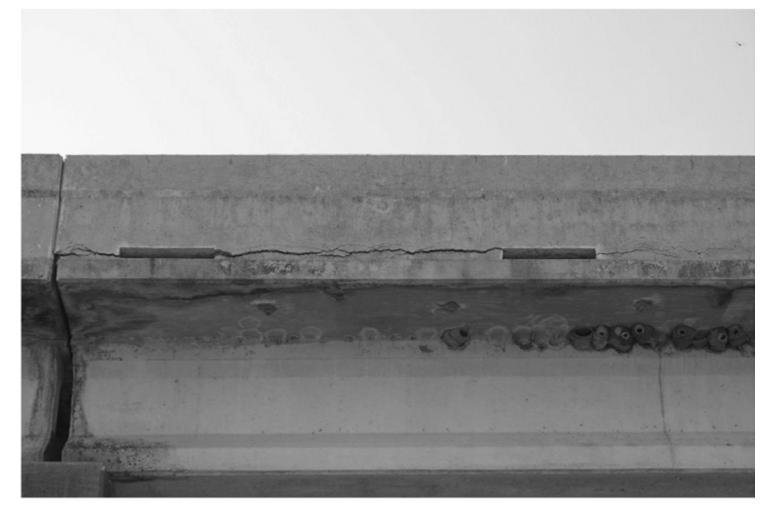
CRACK IN NORTHWEST BRIDGE RAIL IN SPAN 10, LOOKING SOUTHEAST.
